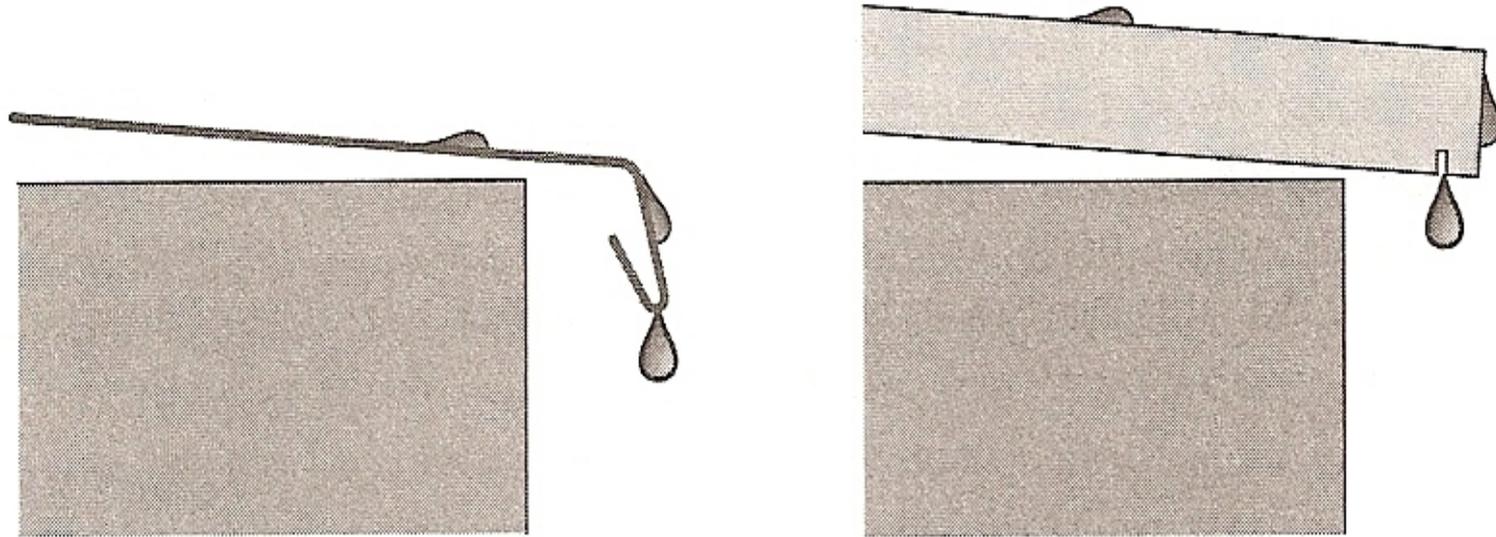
Drip edges used to control surface tension at parapets and sills
